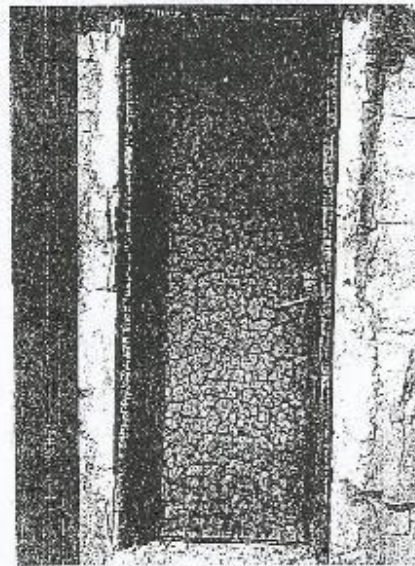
The photo of the exposed surface of the door (II) assembly after the test.
